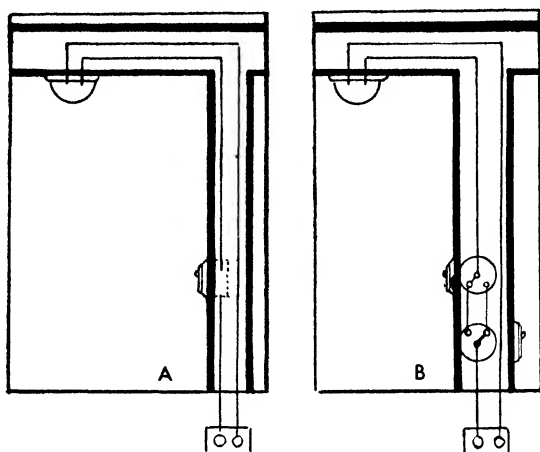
At *A*, a Ceiling Light controlled by a Wall Switch, and at *B*, a similar light controlled from either of two wall switches.
